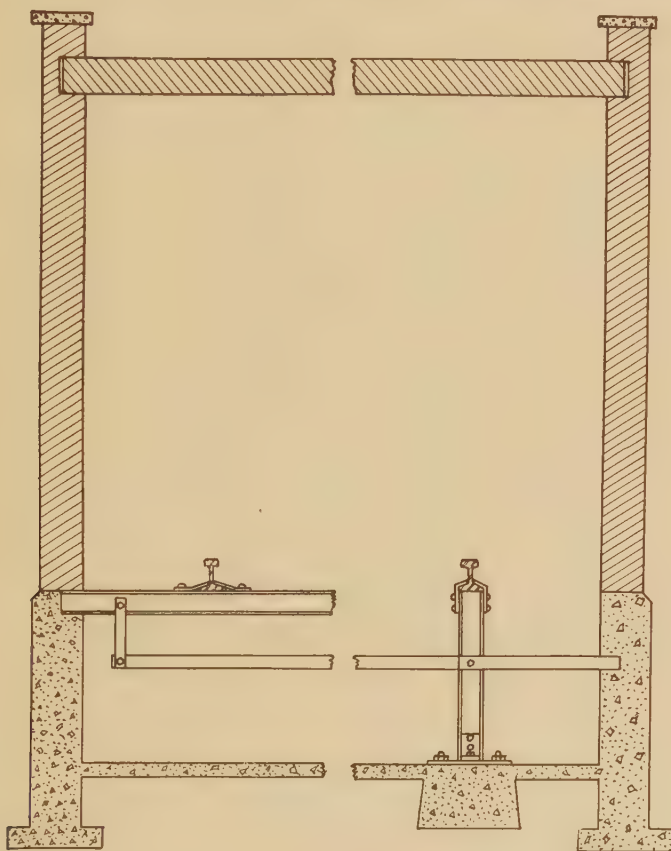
Kiln cross section, showing systems of supporting rails.
